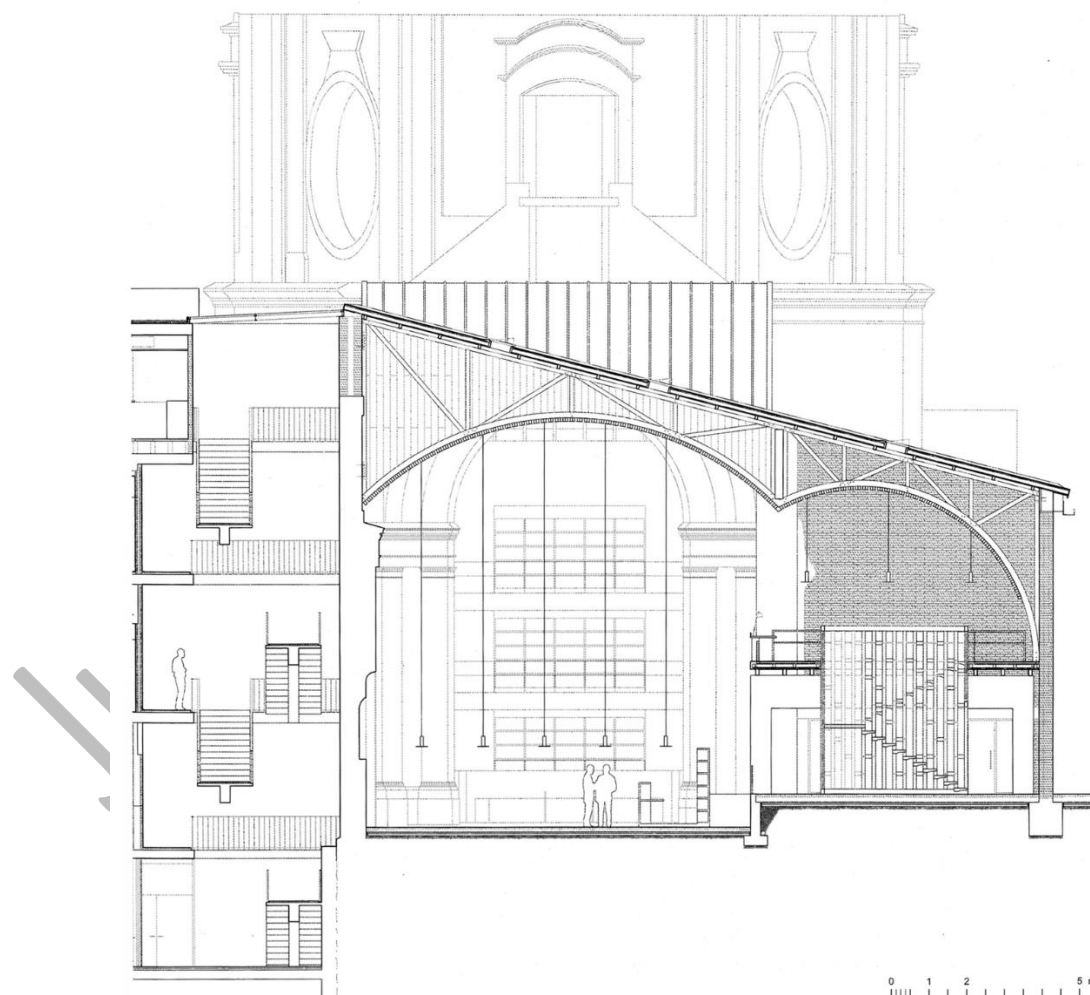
Construction section of the Escuelas Pías *wooden velarium*, drawing by Linazasoro&Sánchez
